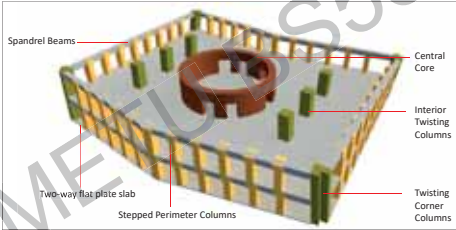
Structural Orthogonal Drawing of Cayan Tower, drawn by Fatih Topak
